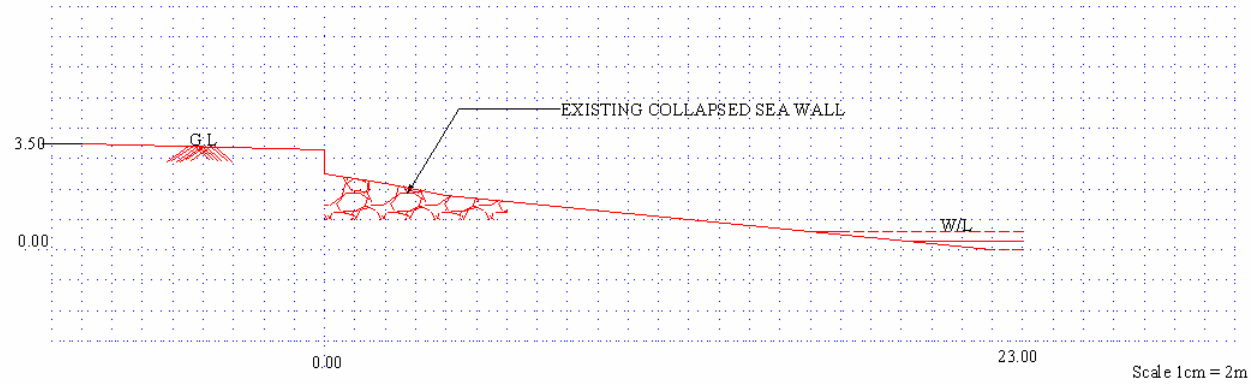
Cross-section of the existing damaged seawall (as per KID) at Kappil
